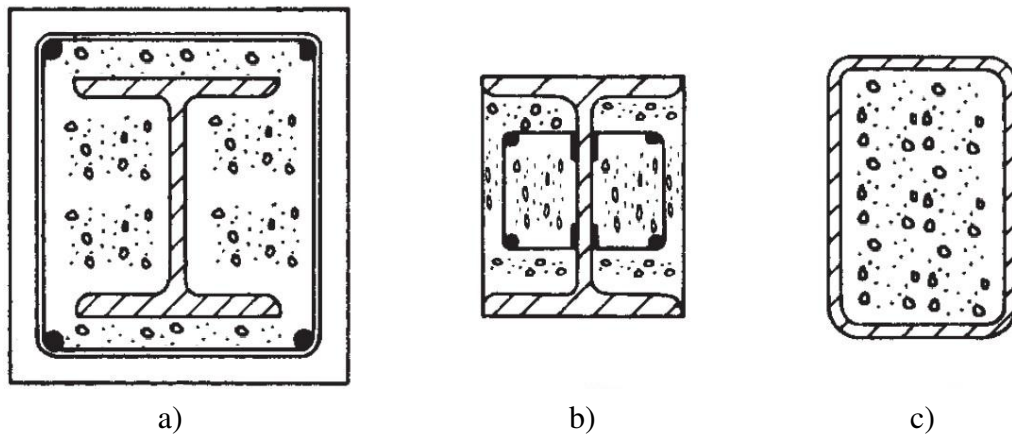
Composite column, a) for concrete-encased H-section, b) for concrete encased I-section and c) for concrete filled steel tube (Johnson, 2004)
